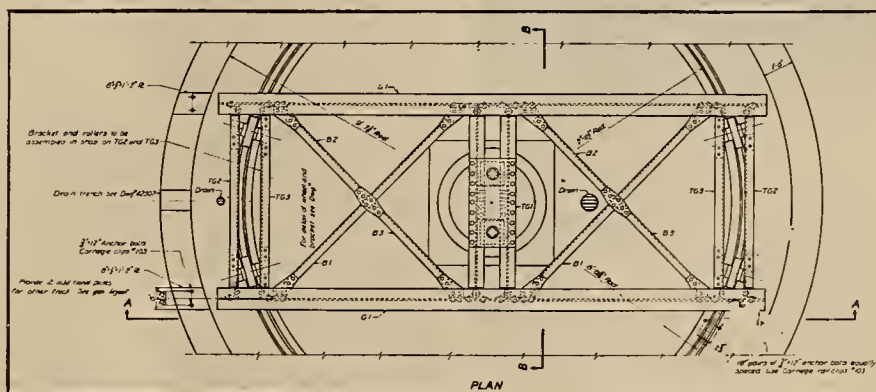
Plan view of Pit 3 turntable showing structural features.
